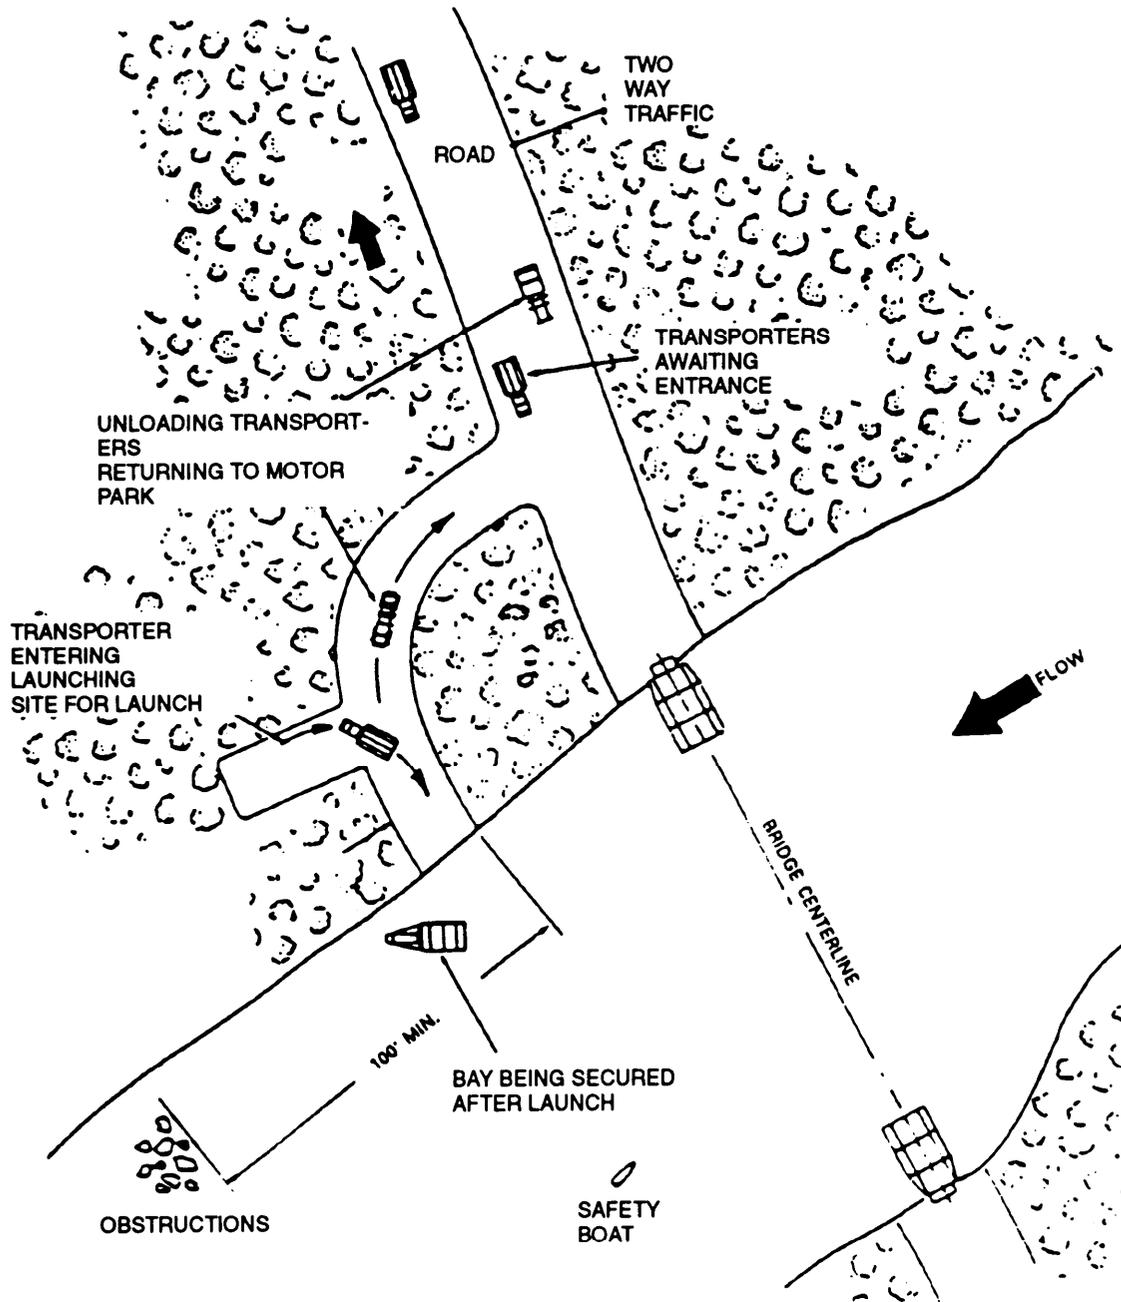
Bridge Assembly Site Layout for Single Launch Site (Successive Bay Assembly).
